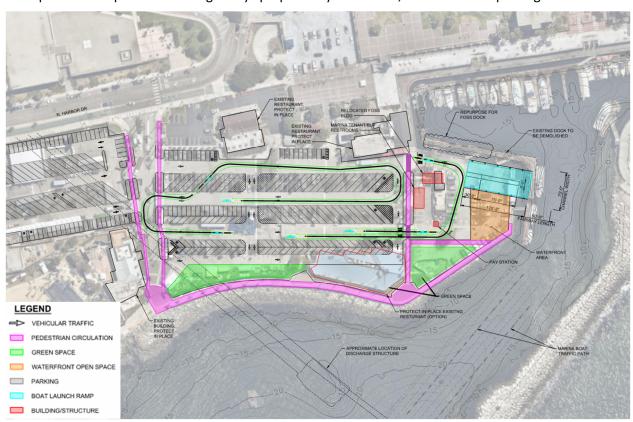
Proposed Alternative Layout for Redondo Beach Boat Launch Ramp (ALT 1)
